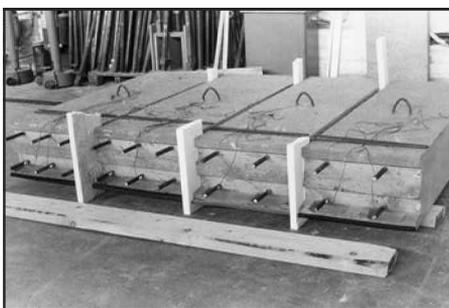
Above is joint before casting with reinforcement to be spliced and transverse bars on top. Below are four halves of specimens before jointing
